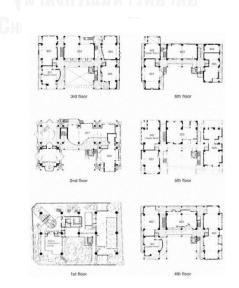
Floor plans, NEXT 21, Osaka, Japan (drawing courtesy of Shu-Kho-Sha Architecture and Urban Design Studio)
